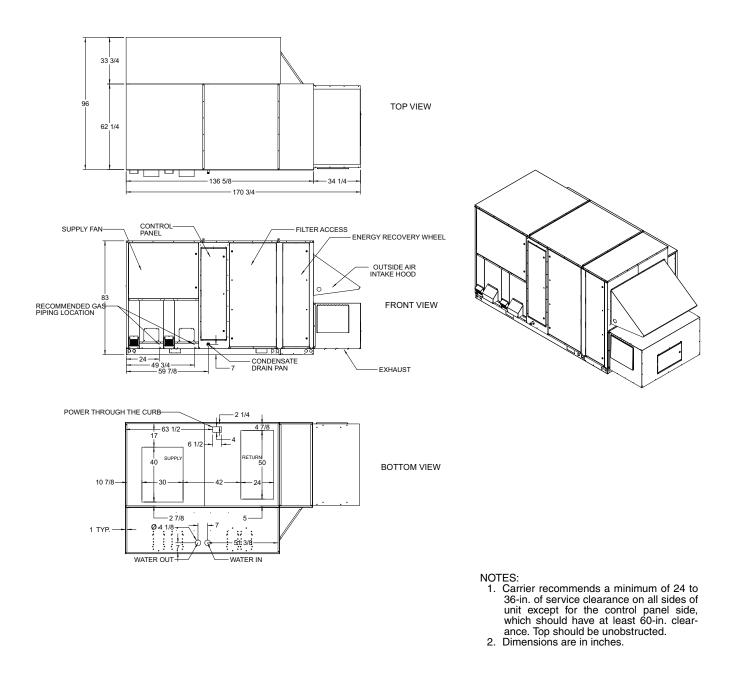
Unit Dimensions — 62RC,RD22-38 Units with Optional Exhaust
